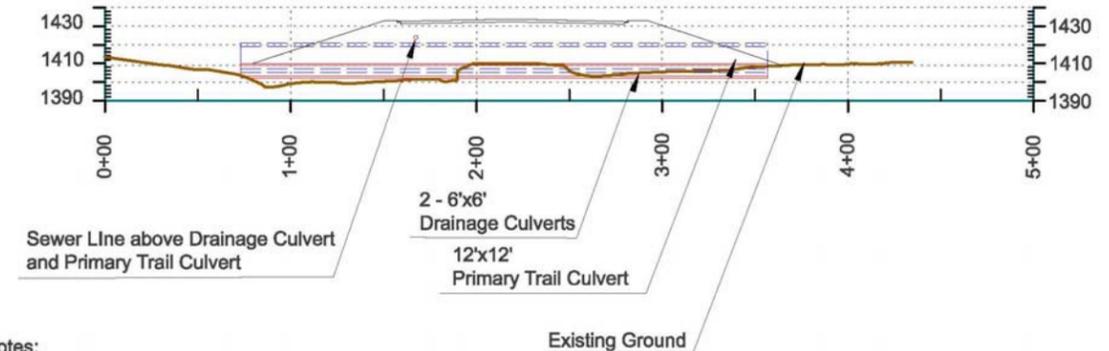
Alternative 2: Separate Drainage Culverts and Primary Trail Culvert, with Sewer Line Above Drainage Culvert and Primary Trail (Profile View)
